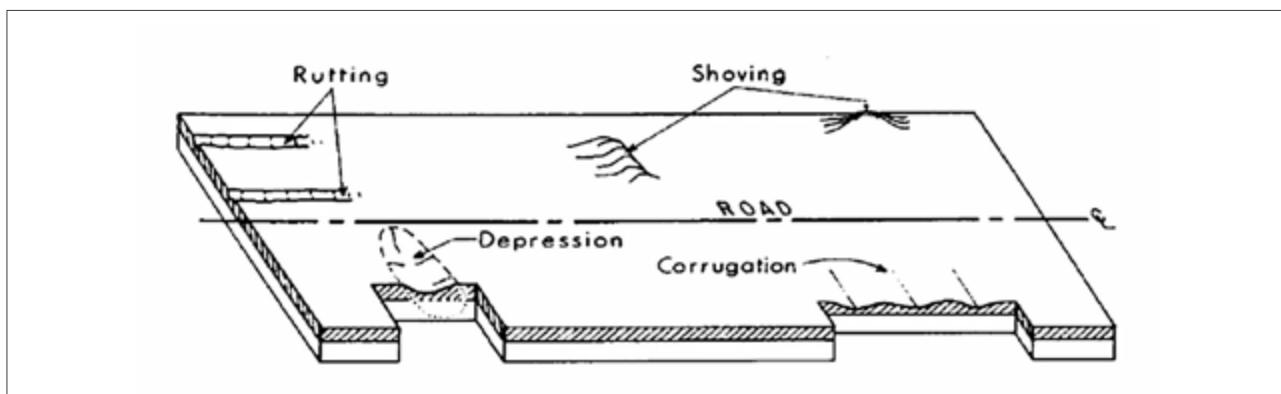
Deformation Defects in Flexible Pavement
